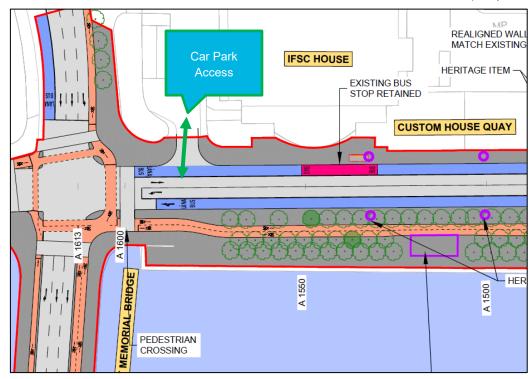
Extract from EIAR Volume 3, Chapter 4 Drawings Part 2, General Arrangements, Sheet 1
